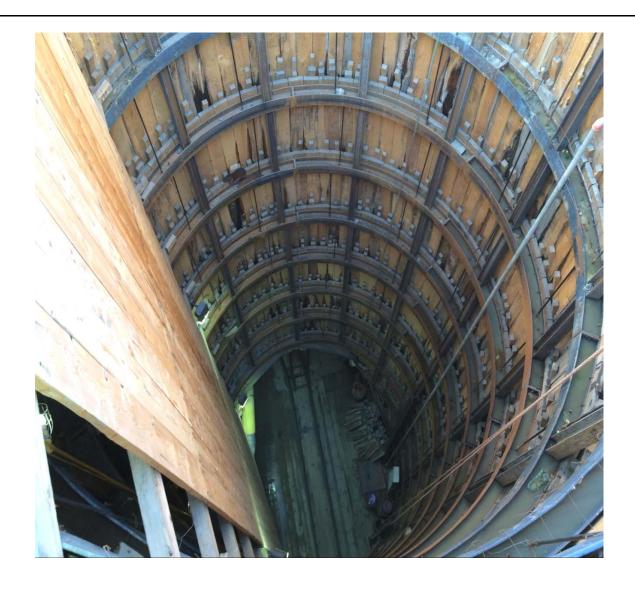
SESS Stage SW4- 16'-6" diameter Working Shaft, depth of 18.0 m below ground elevation
